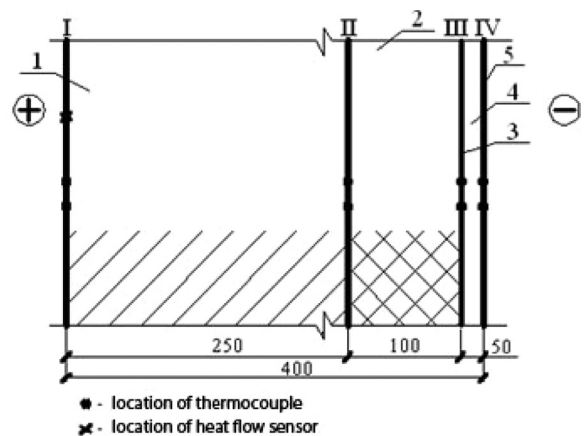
The layout of thermocouples and heat flow sensors along the external wall section with a ventilated thermal insulation system: 1 – full-size ceramic bricks; 2 – thermal insulating plate; 3 – wind protection; 4 – air space; 5 – steel metal sheet; I, II, III, IV – lines of wall layers.
